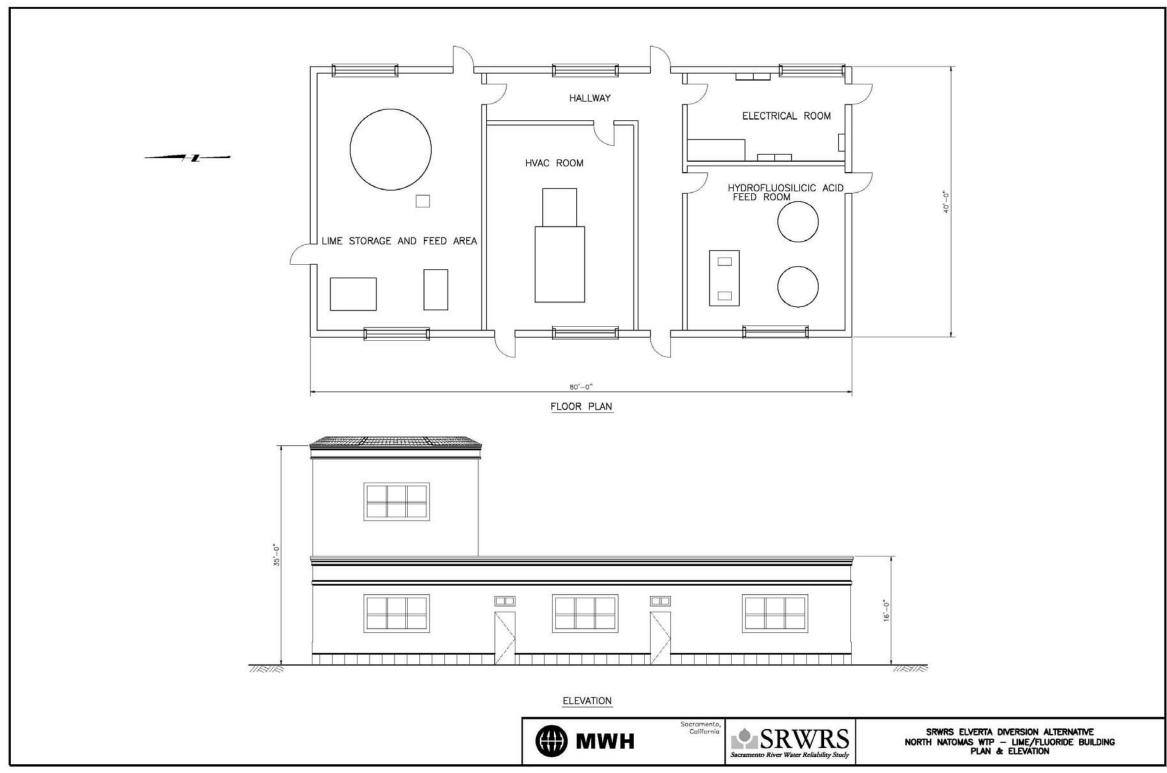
North Natomas WTP – Lime/Fluoride Building Plan and Elevation
